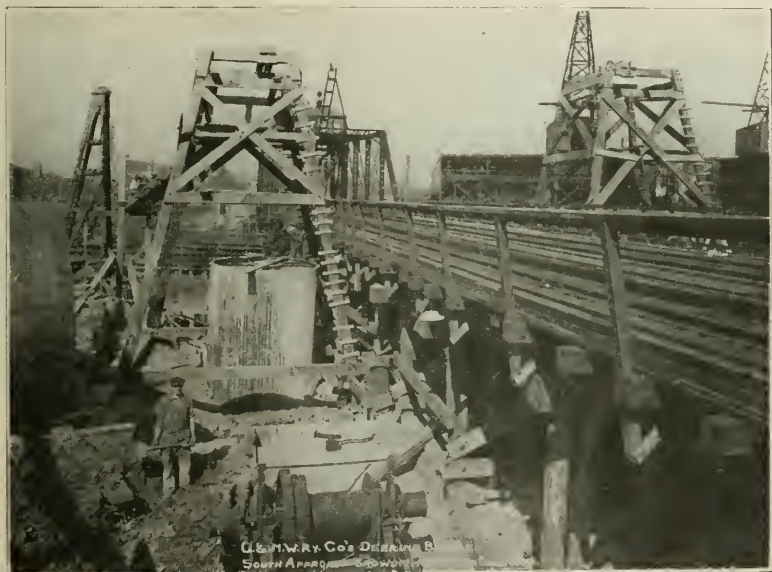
Rear Substructure. Head House in Place for Sinking Cylinder.
